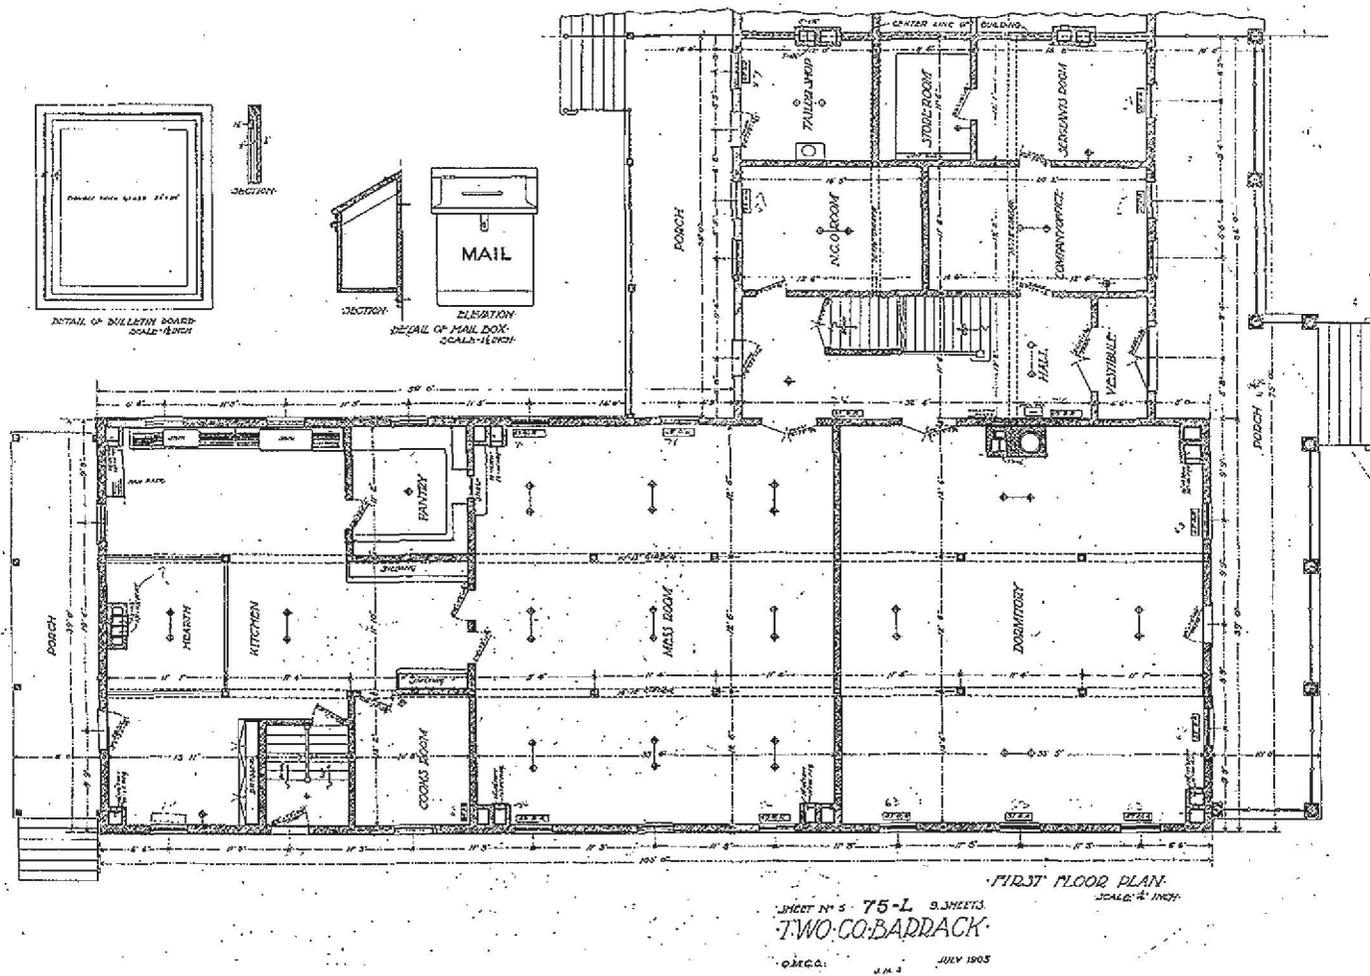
Partial floor plan of Building 100 for two company barracks. GGNRA Park Archives and Records Center, NPS; 1905.
